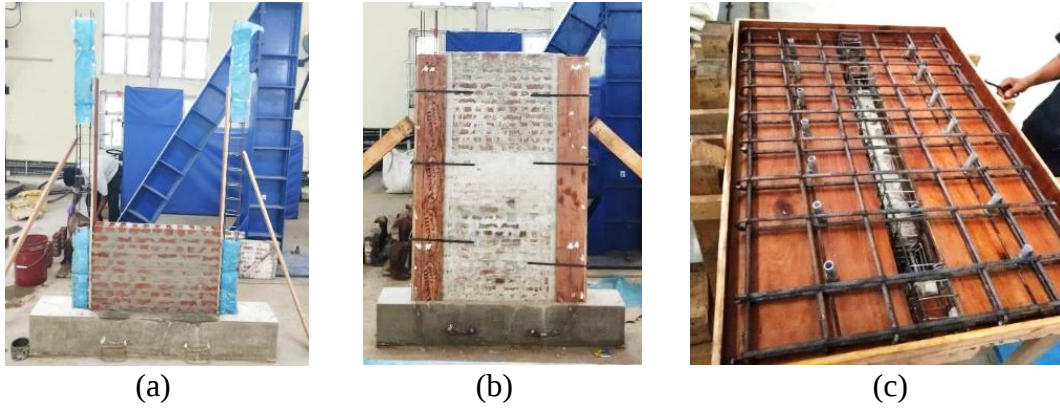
Construction of the CM wall specimens: (a) Masonry wall construction, (b) Casting of tie-columns, (c) Tie-beam and slab construction.
